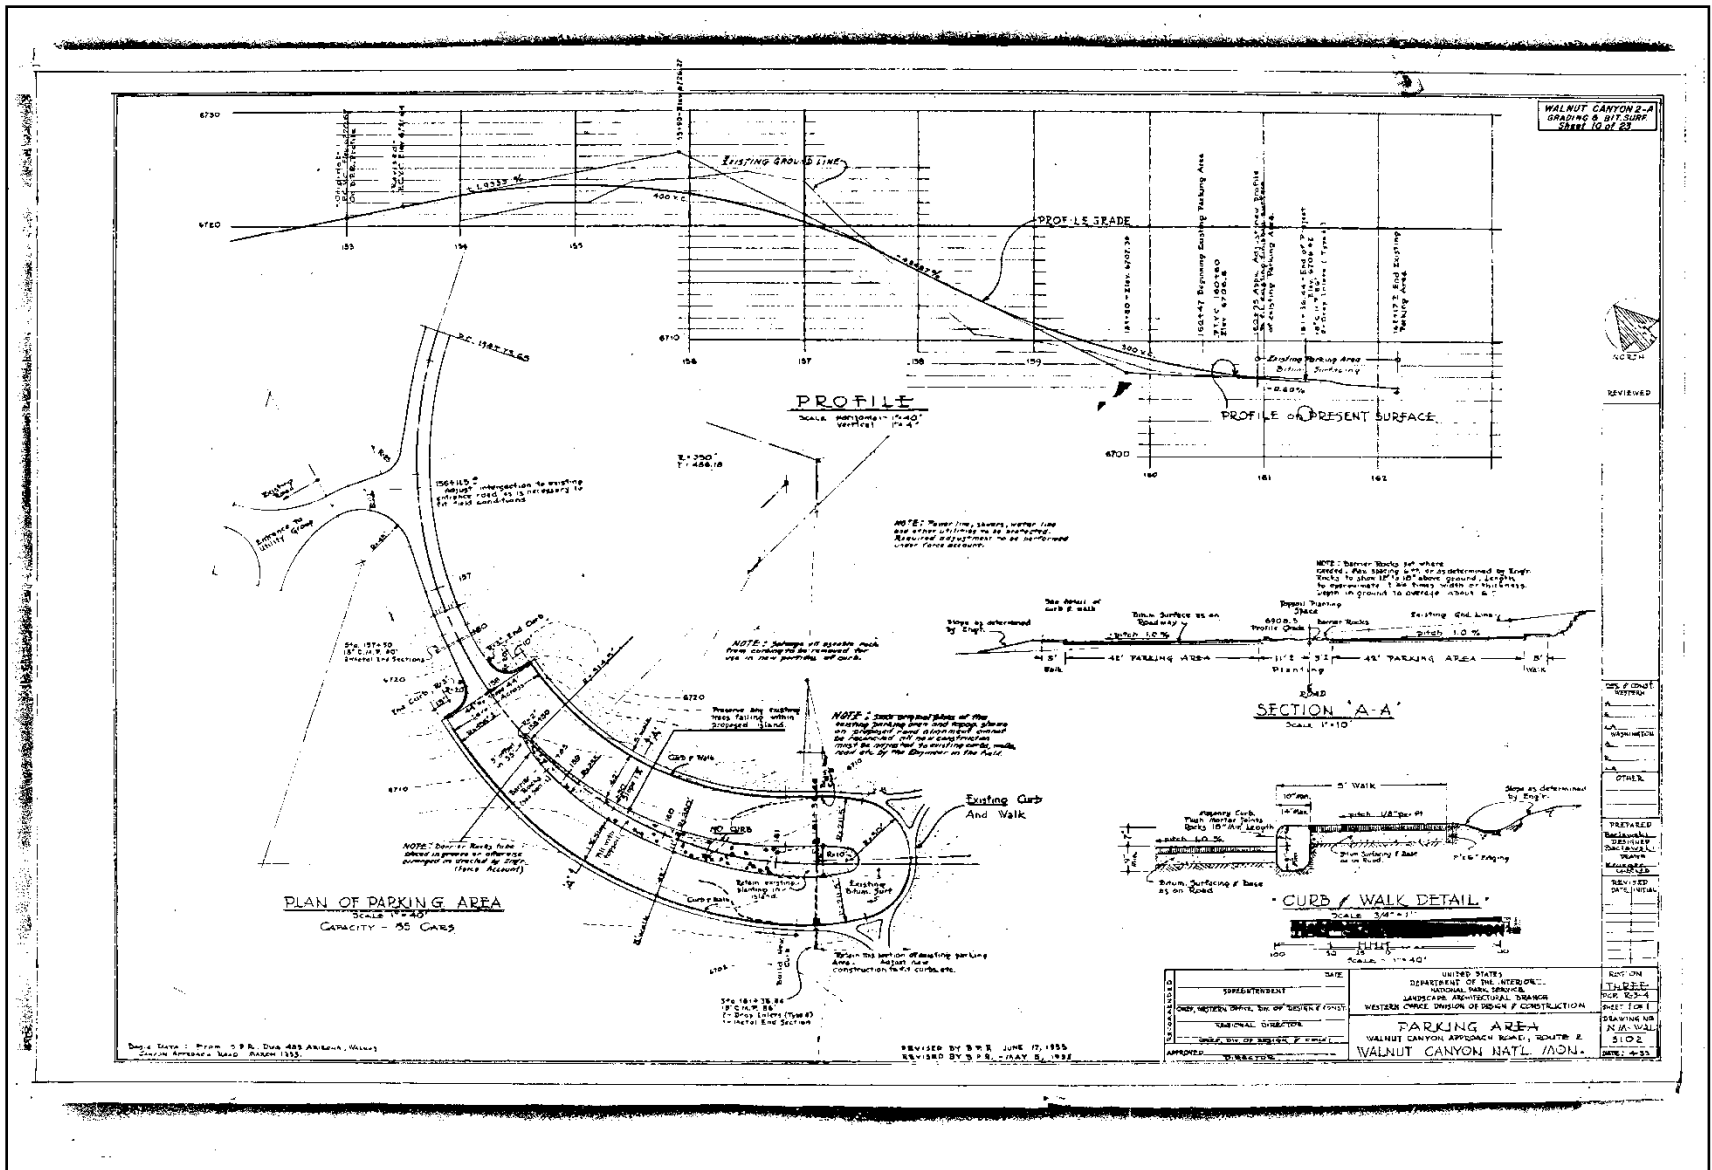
Construction plans for expansion of Administration Building Parking Area, as part of Route 2 construction (NPS Dwg NM-WAL 3102), April 1955.
